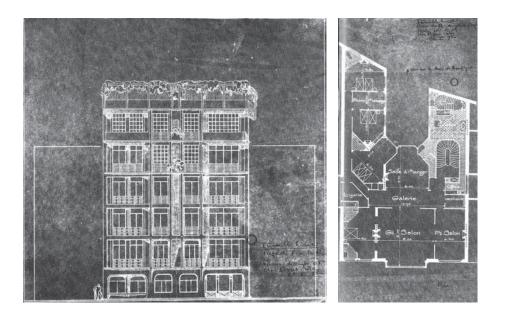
Perret. Apartment house in Paris. Street façade. FIG. 125 Perret. Apartment house in Paris. Typical plan.
